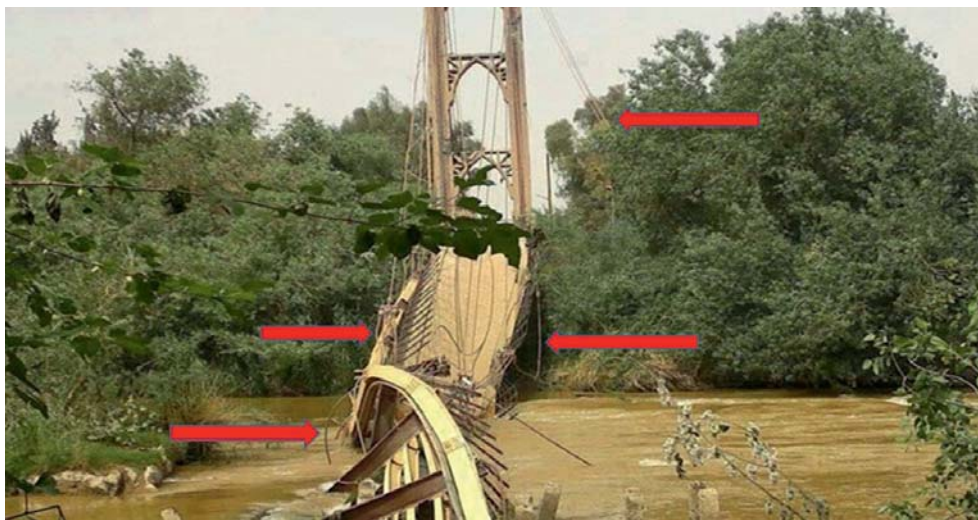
The cable-stayed suspension bridge of Deir ez-Zor after destruction in 2013. The arrows show damage
